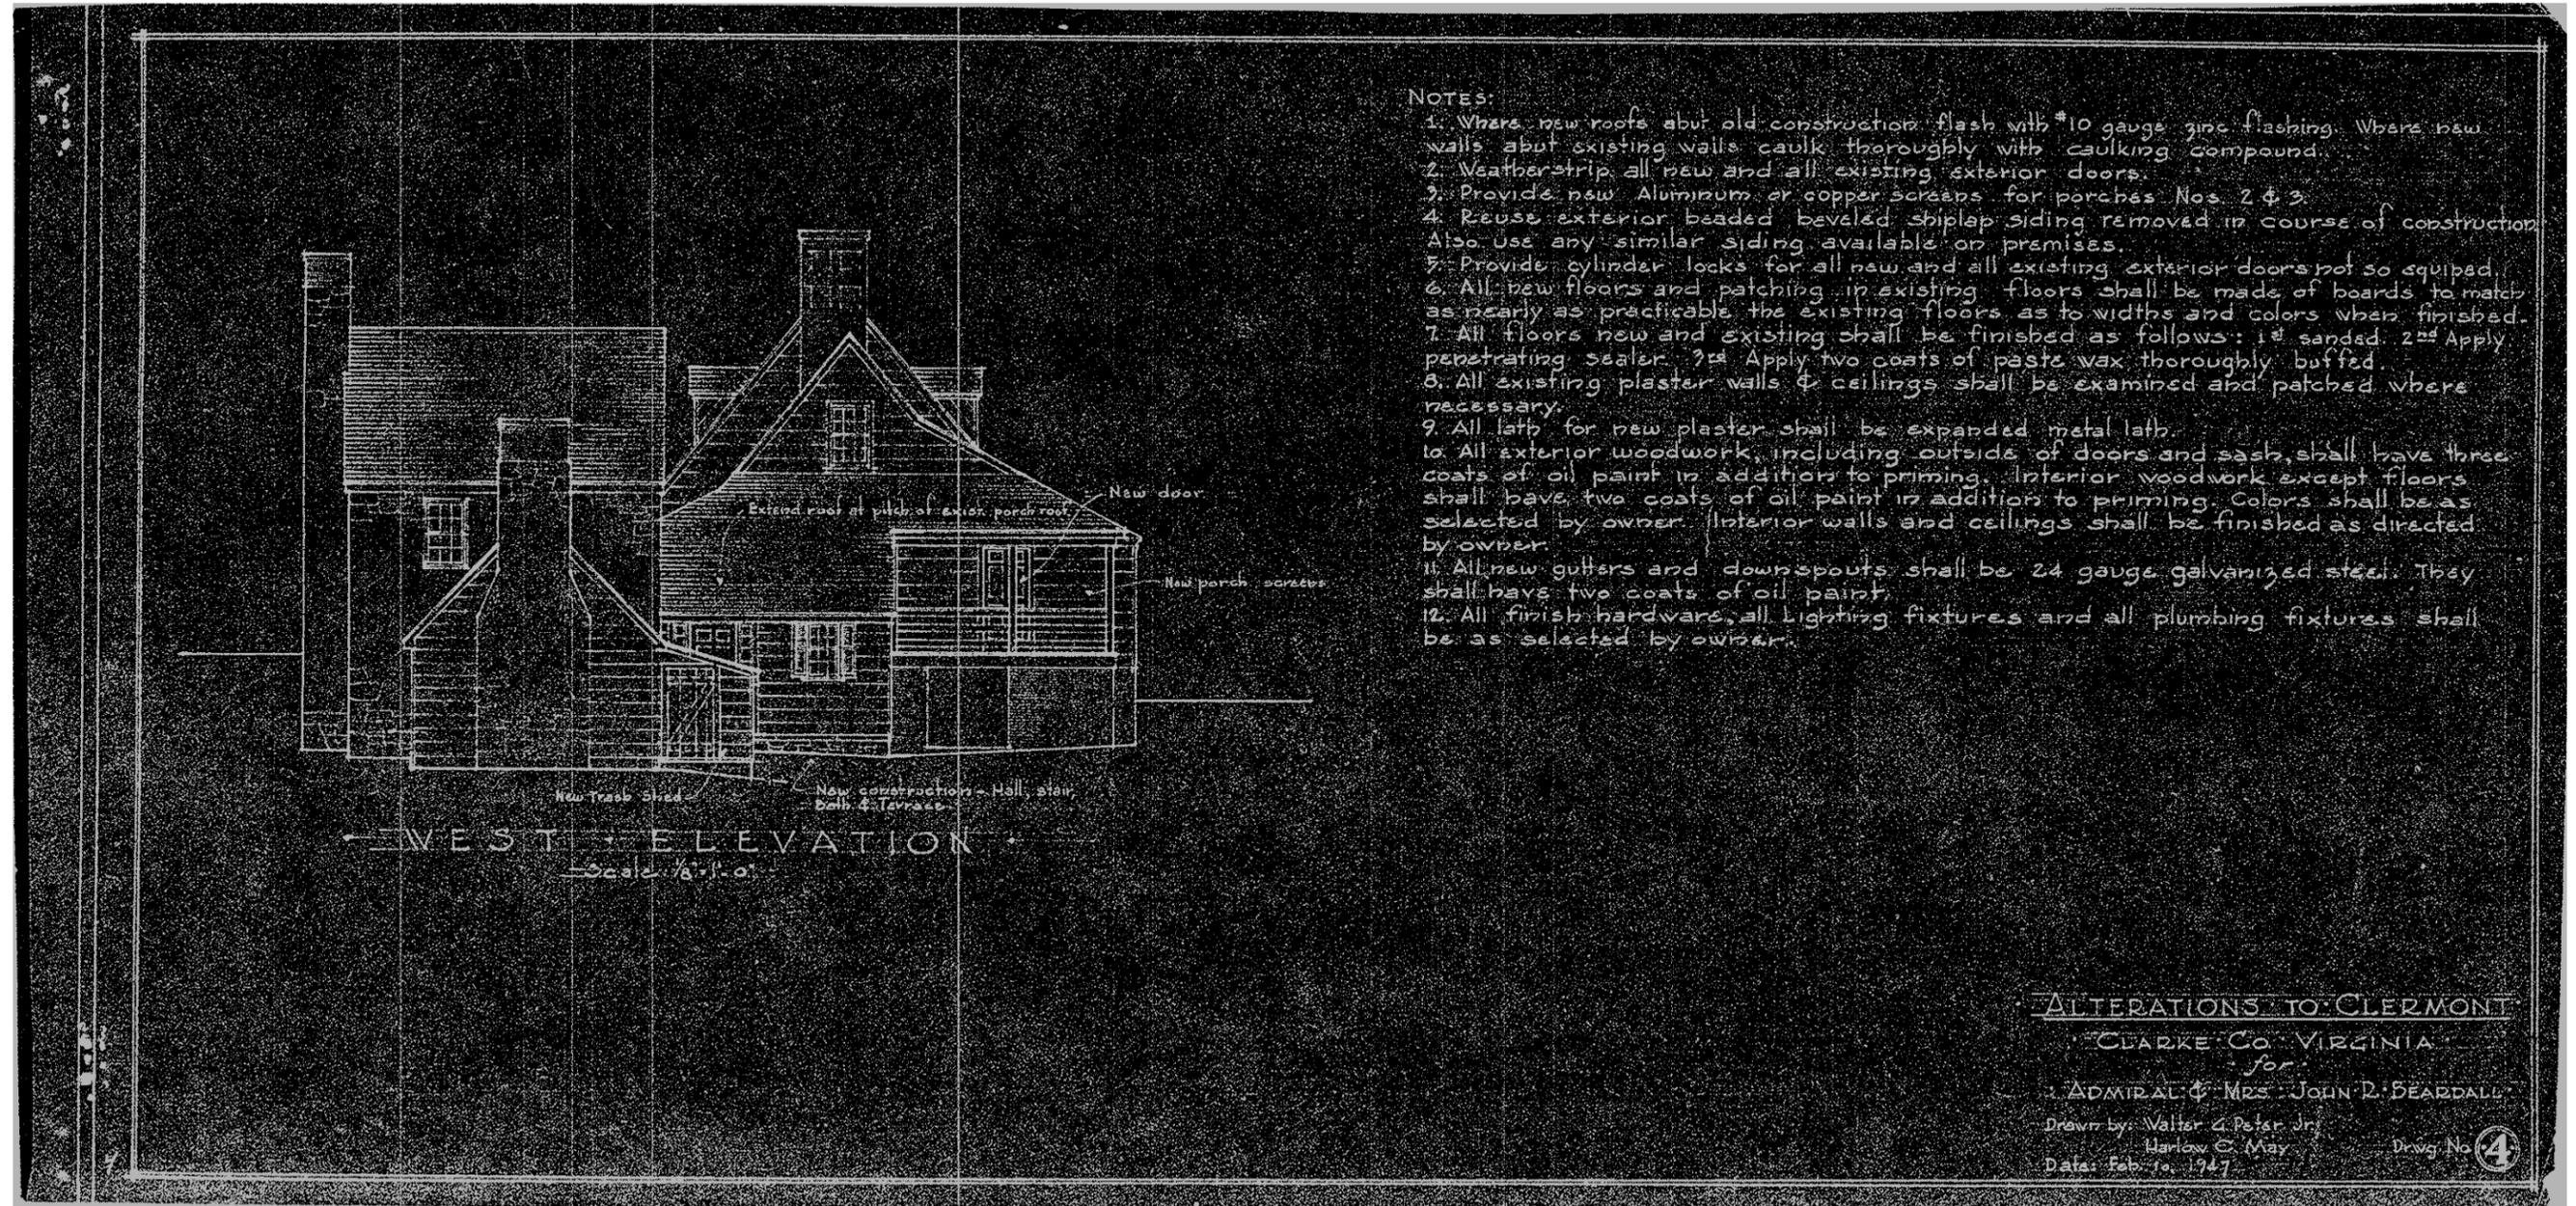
West elevation and notes of the 1947 alteration construction drawings (not to scale).
